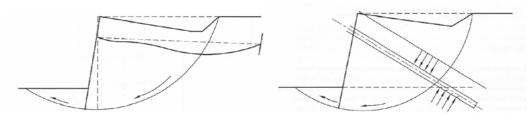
Loss of total stability with a sliding plane through the line of the anchor: steel cable (left) and anchor pile (right)
